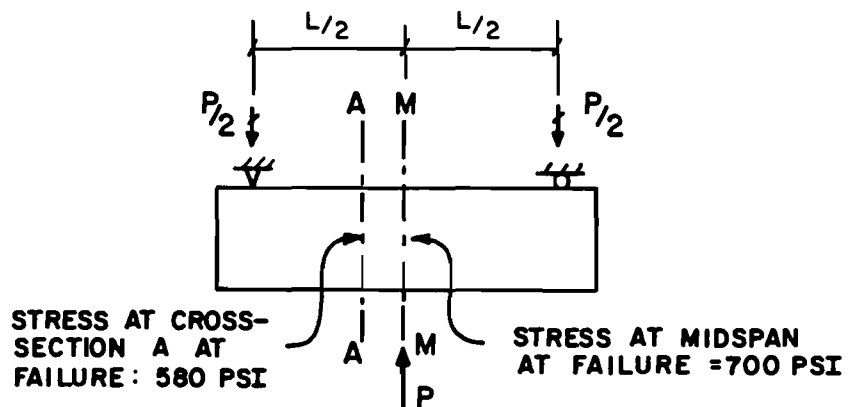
Beam tested in center point loading; failure occurs at midspan at 700 psi.
